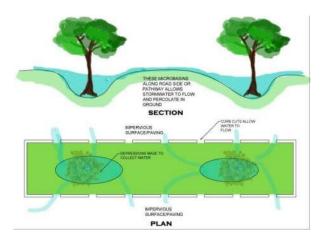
Plan and section for Designed plantation or existing trees near paved areas.
